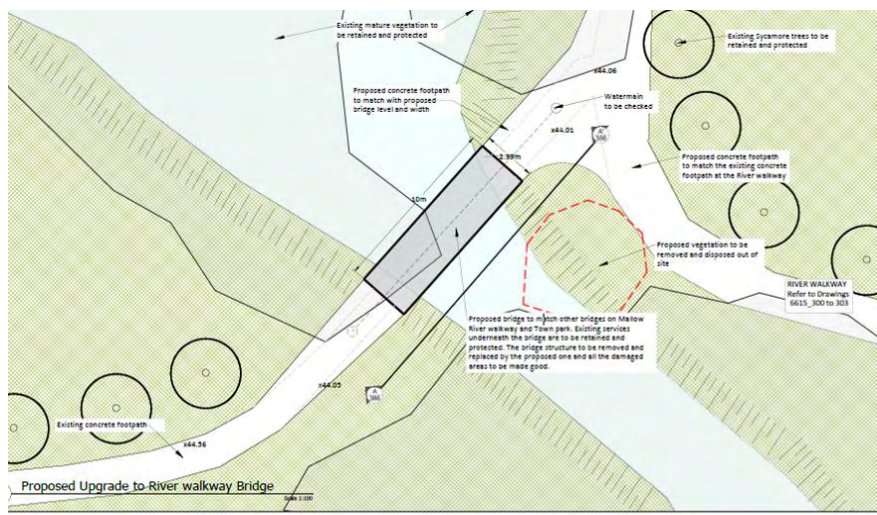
Extract from Architects Proposed Bridge Widening Drawing
